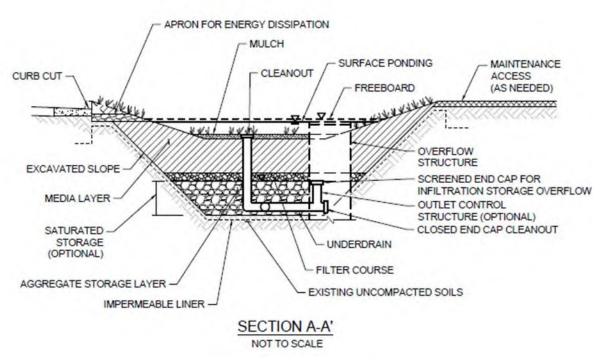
Typical Plan and Section View of a Biofiltration BMP
